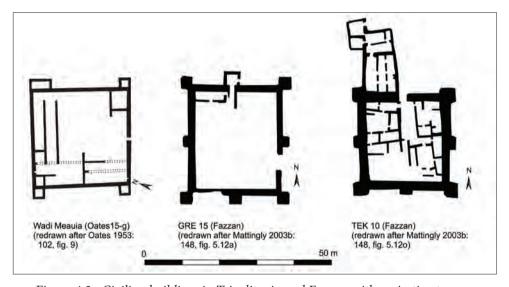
Civilian buildings in Tripolitania and Fazzan with projecting towers.
